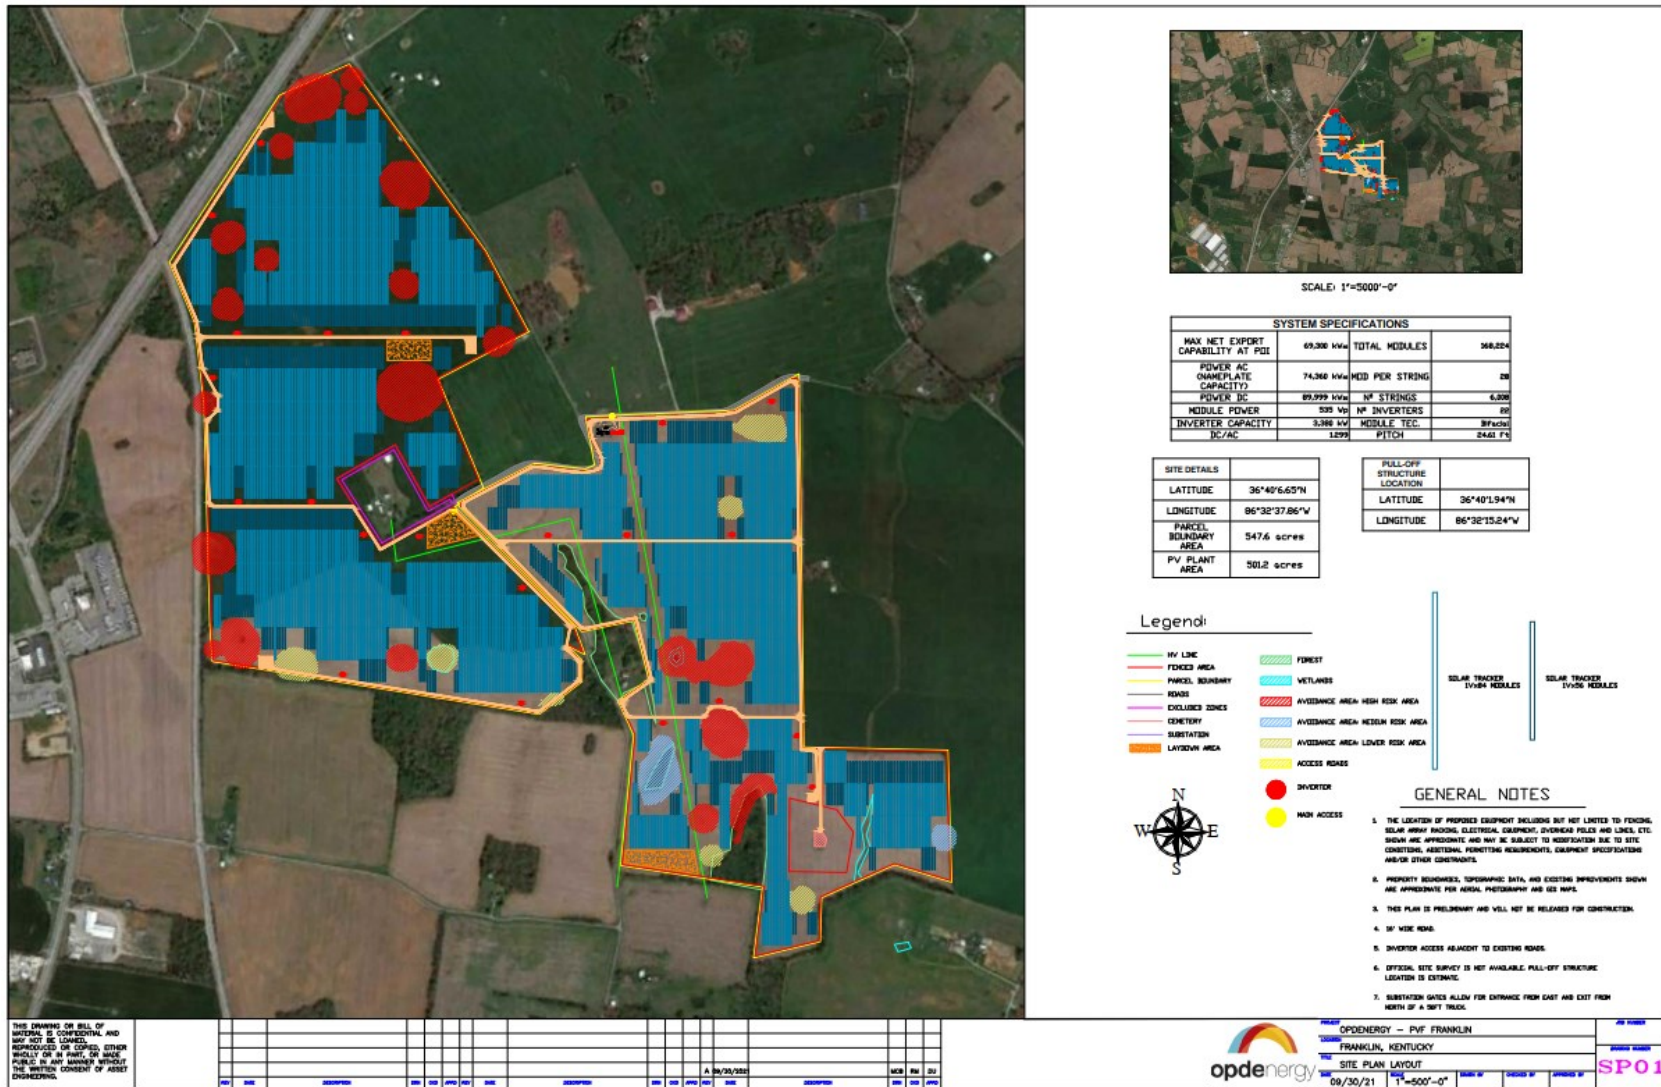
Proposed Horus Kentucky Solar Project Site Layout
